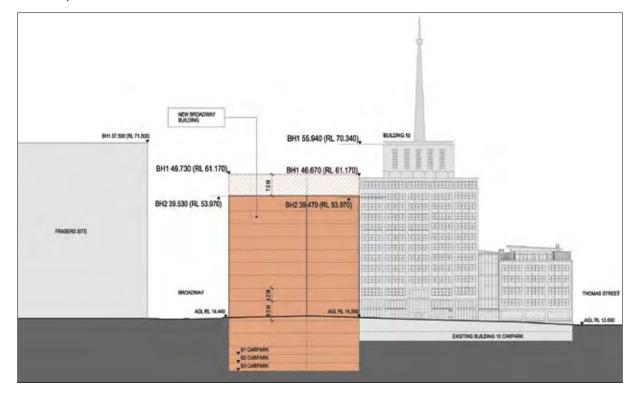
Elevation - western side of Jones Street (Source: BVN)
